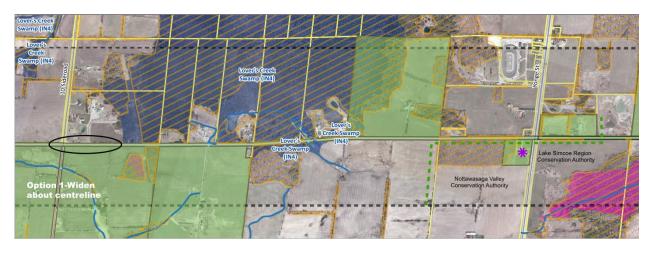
Sub-Section 2-2 - 10 Sideroad to West Boundary of Lover's Creek PSW
